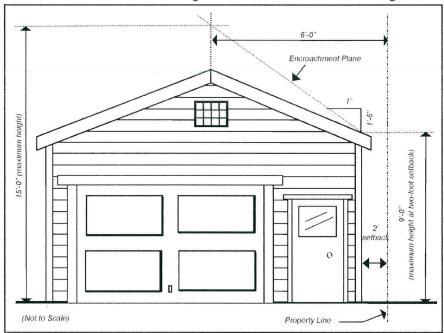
Encroachment Plane and Setbacks for Accessory Structures
